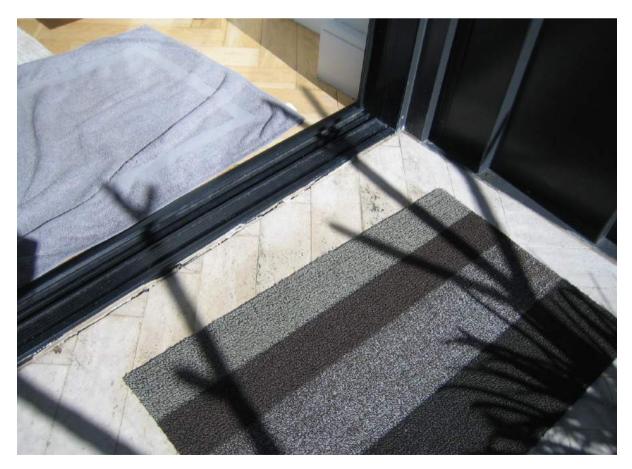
Water penetration and damage in the living room balcony door in Unit 408.
